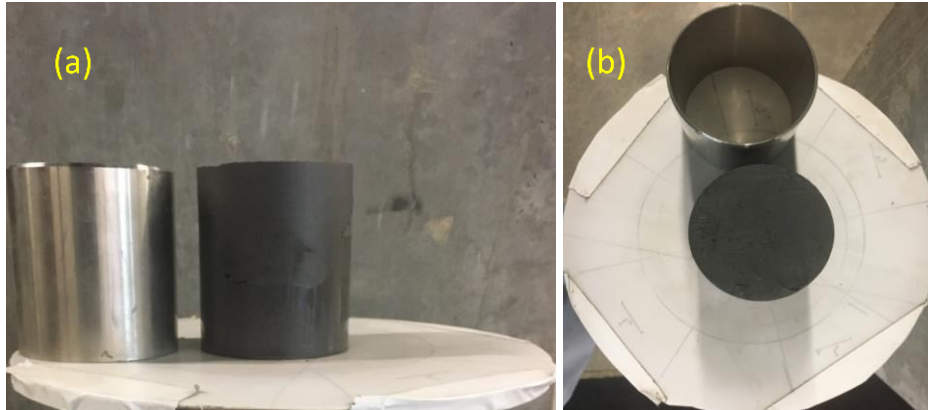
FCR cylindrical specimen prior to the flow table test (a) side view (b) Top view
